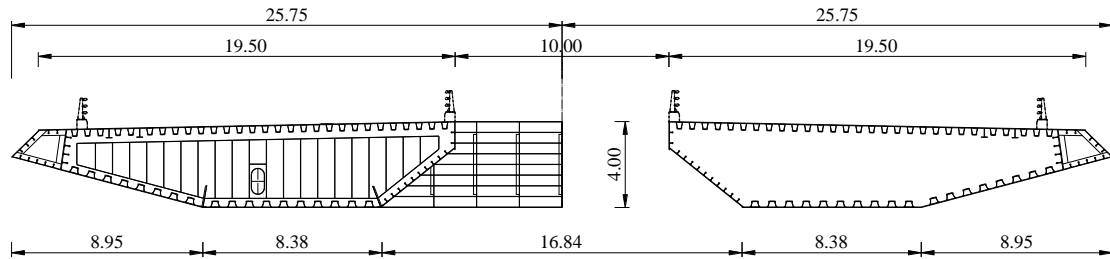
Typical cross section of Shanghai Bridge in the main span (Unit: m)
